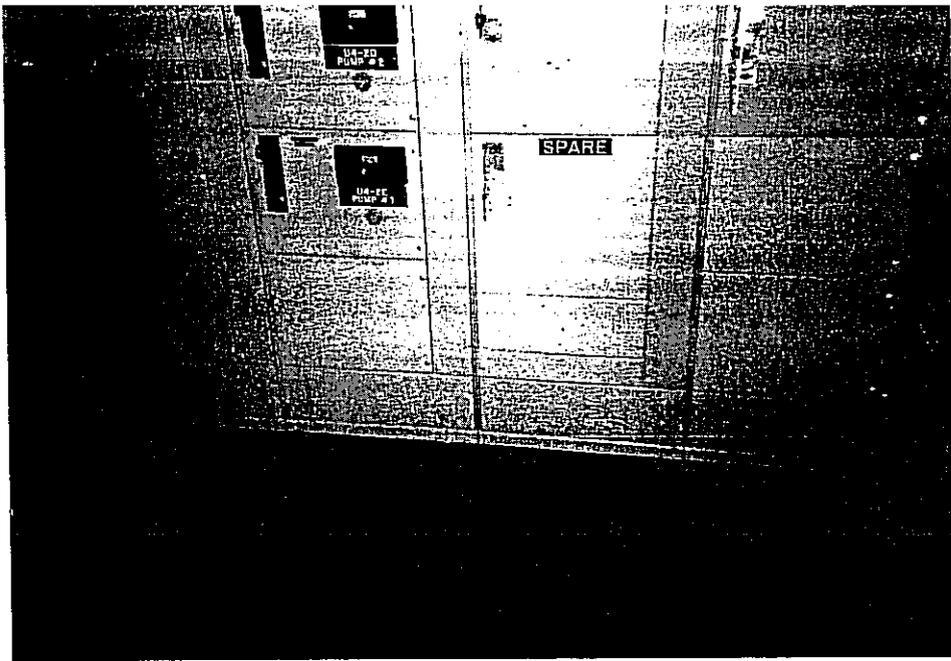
More equipment in the Mezzanine floor. It is unknown whether the equipment is anchored and the anchors are concealed within the metal cabinetry.
